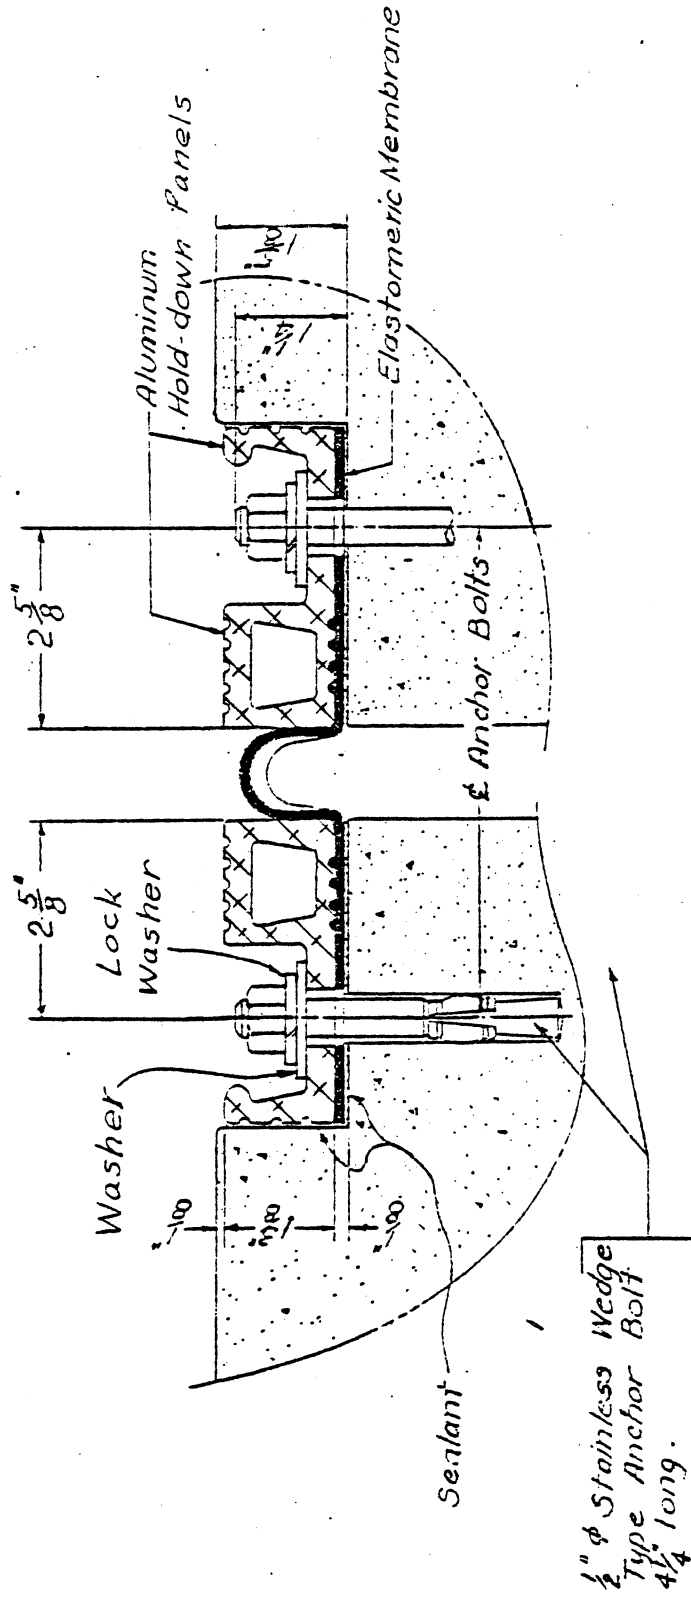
Typical section through the ON-FLEX bridge deck expansion joint.
